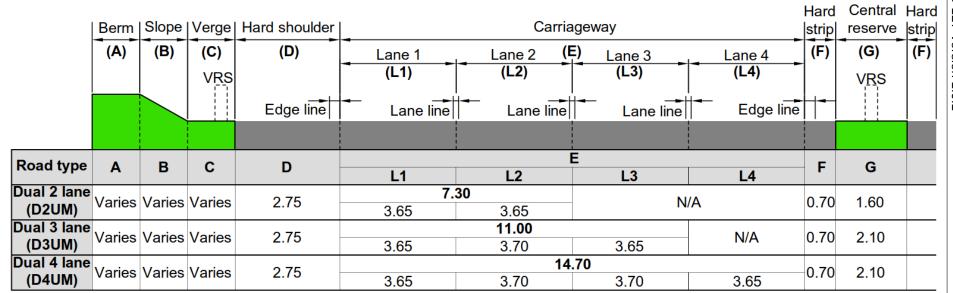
N1c Dimensions of cross-section components for urban motorway mainline
